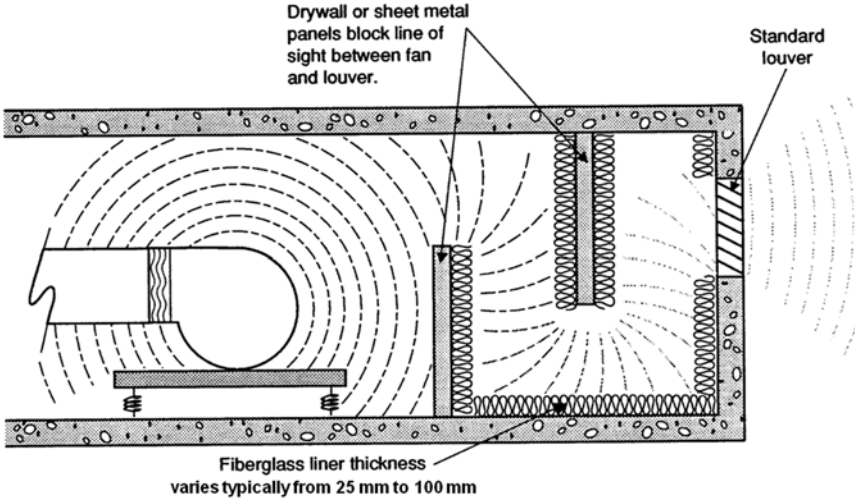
Labyrinth air path used for sound attenuation at an equipment room ventilation opening.
